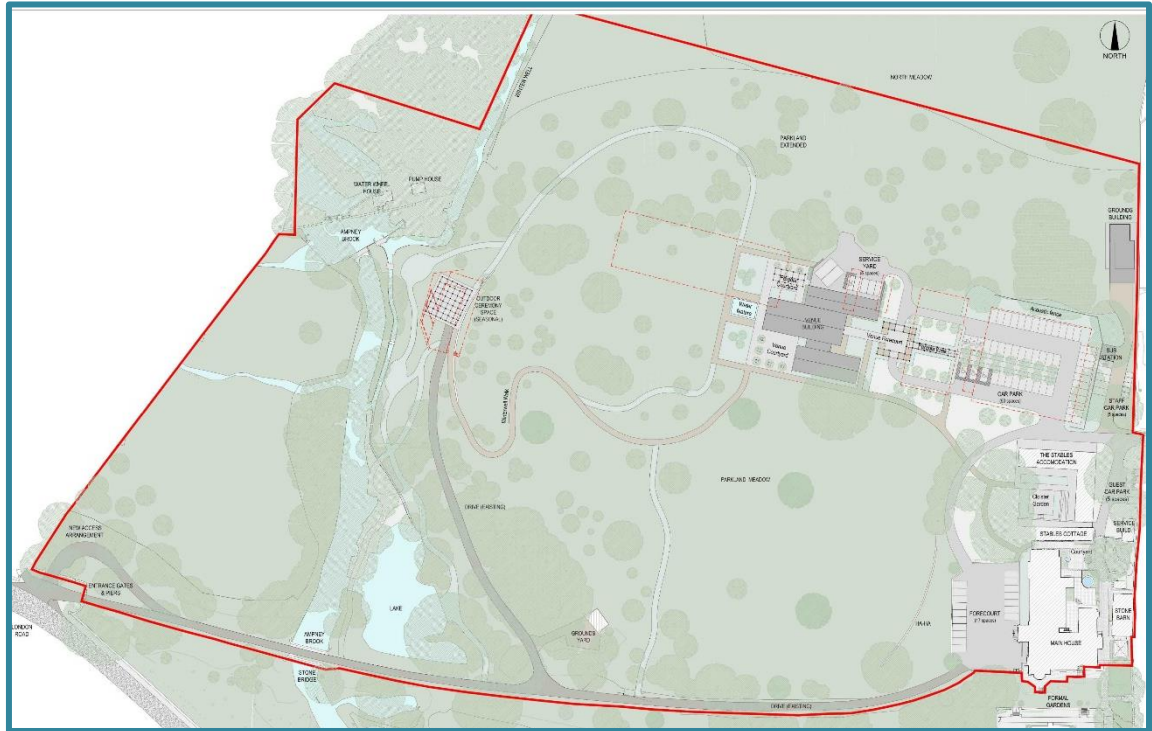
Proposed site plan, a detailed copy is attached in Appendix 1.
